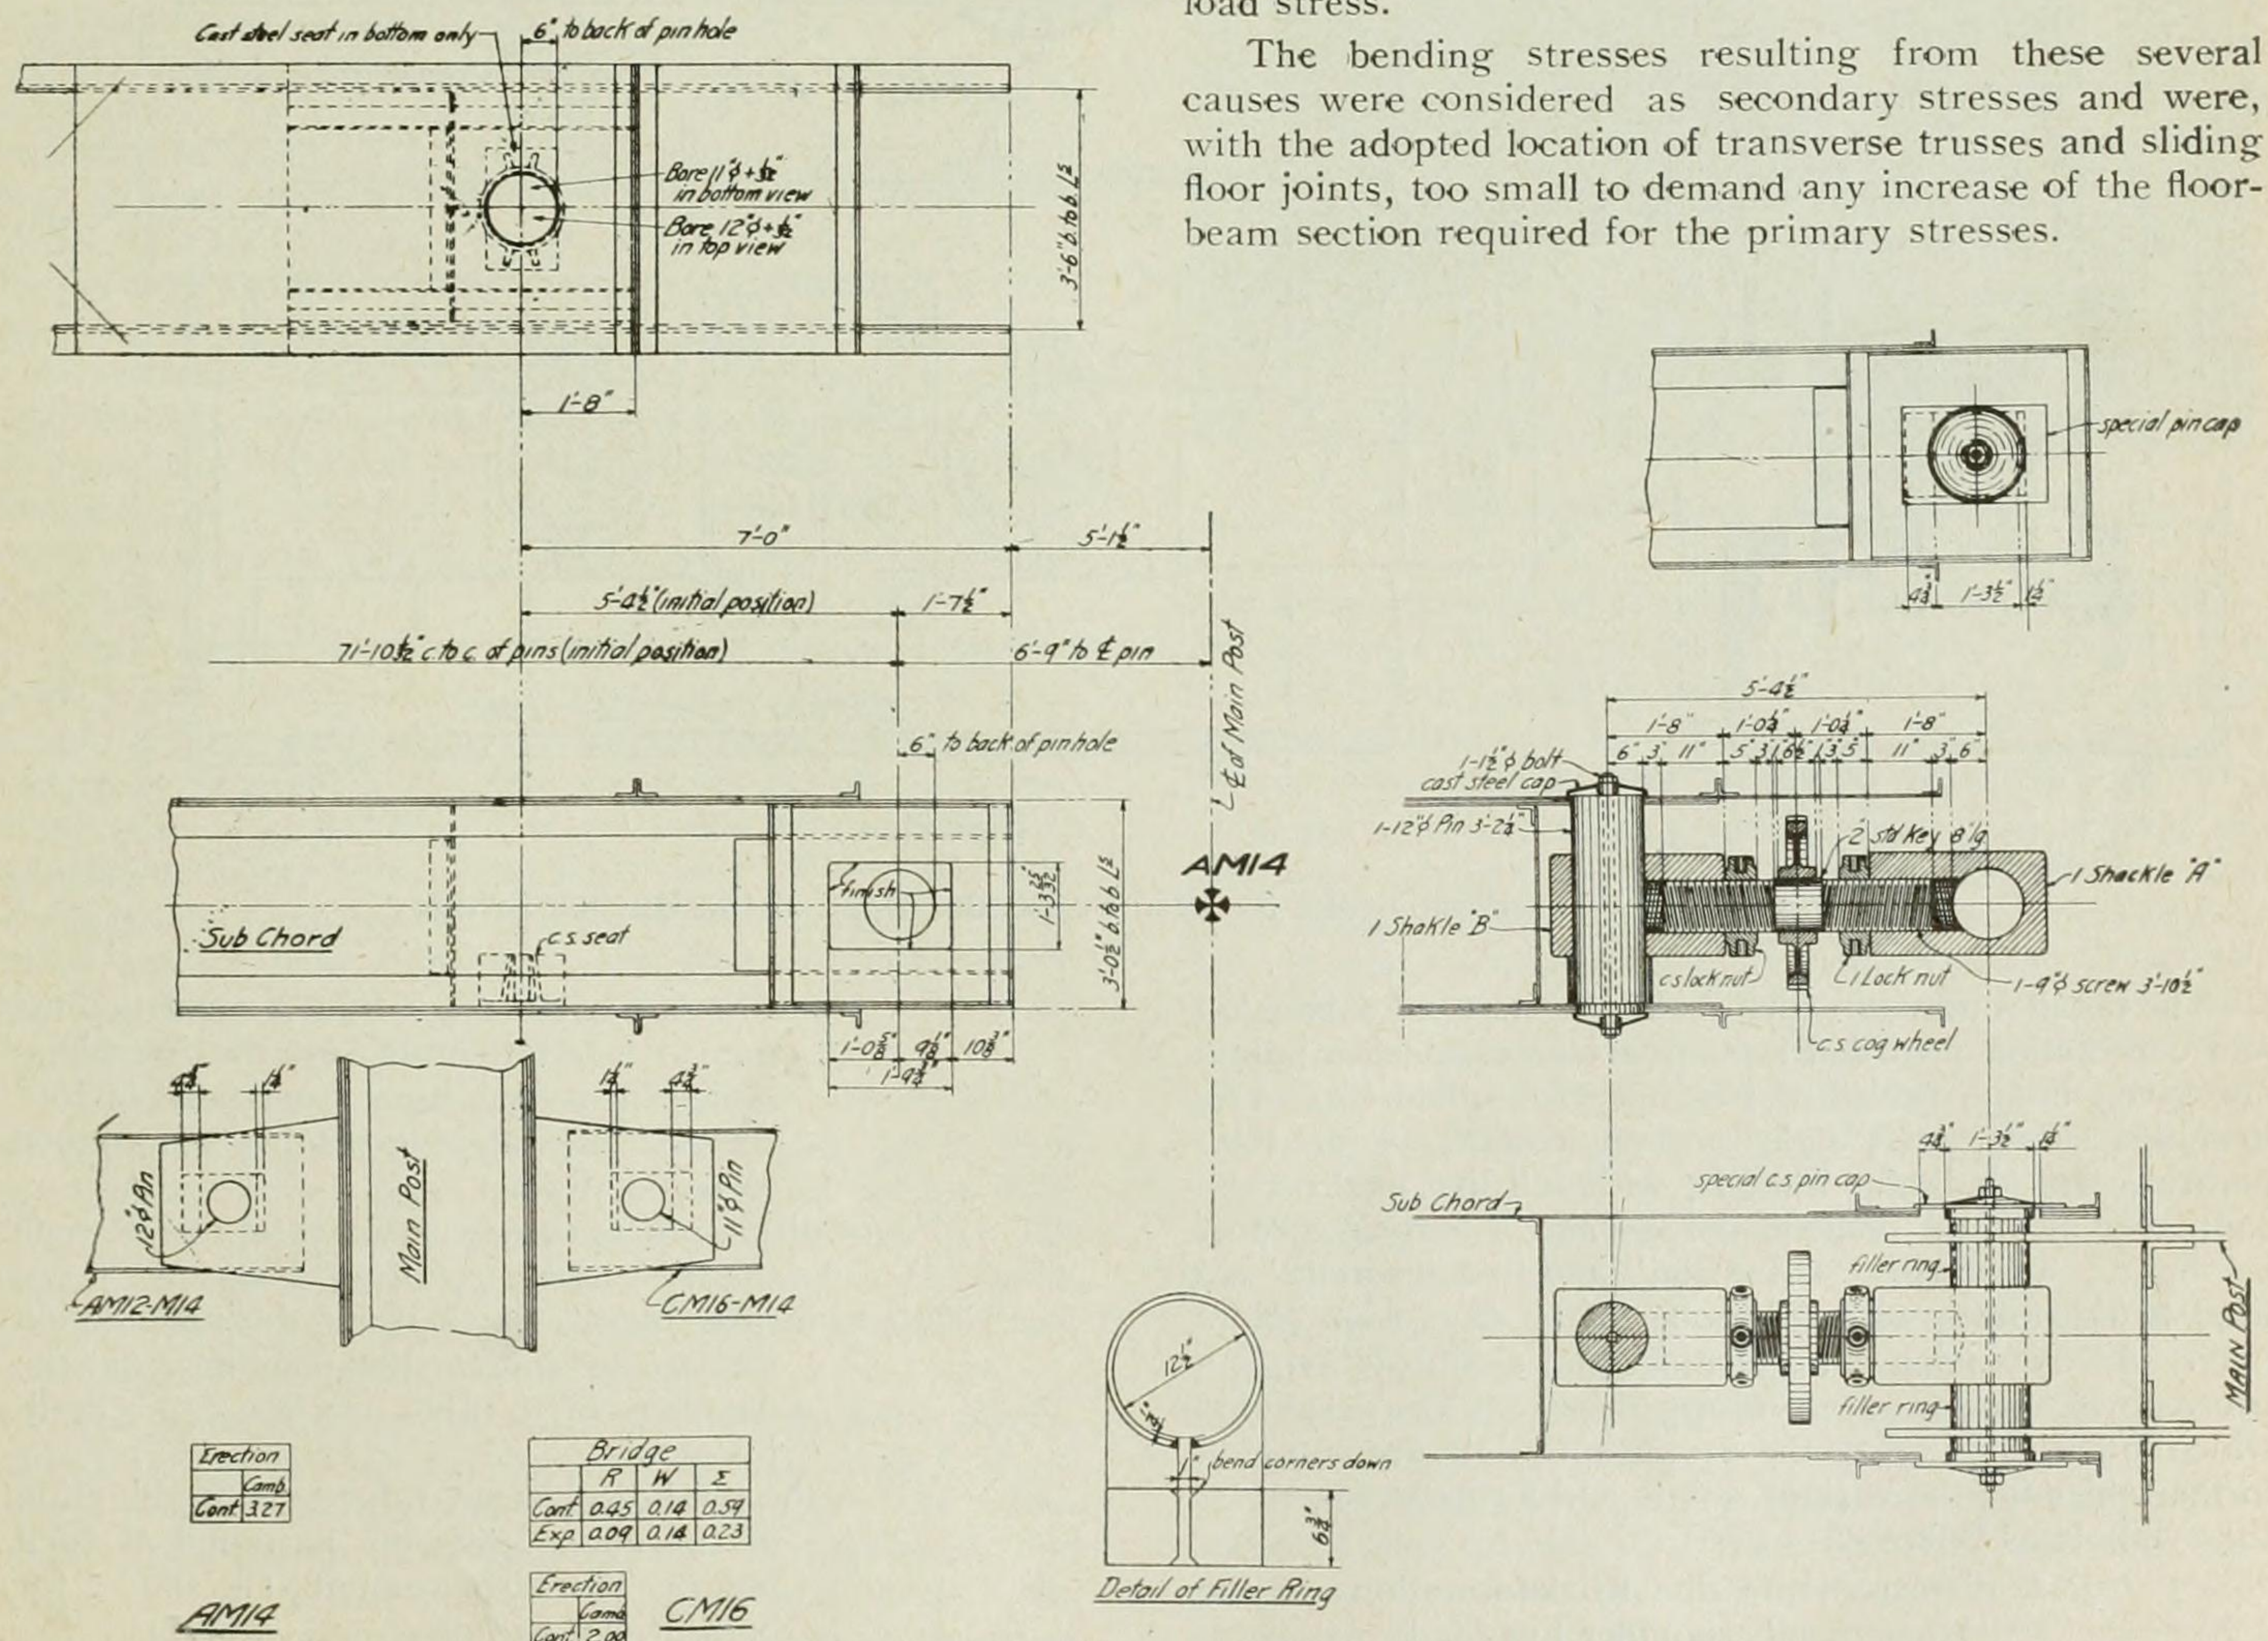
Adjustable Erection Joint Provided in Main Trusses at Panel Point AM14
